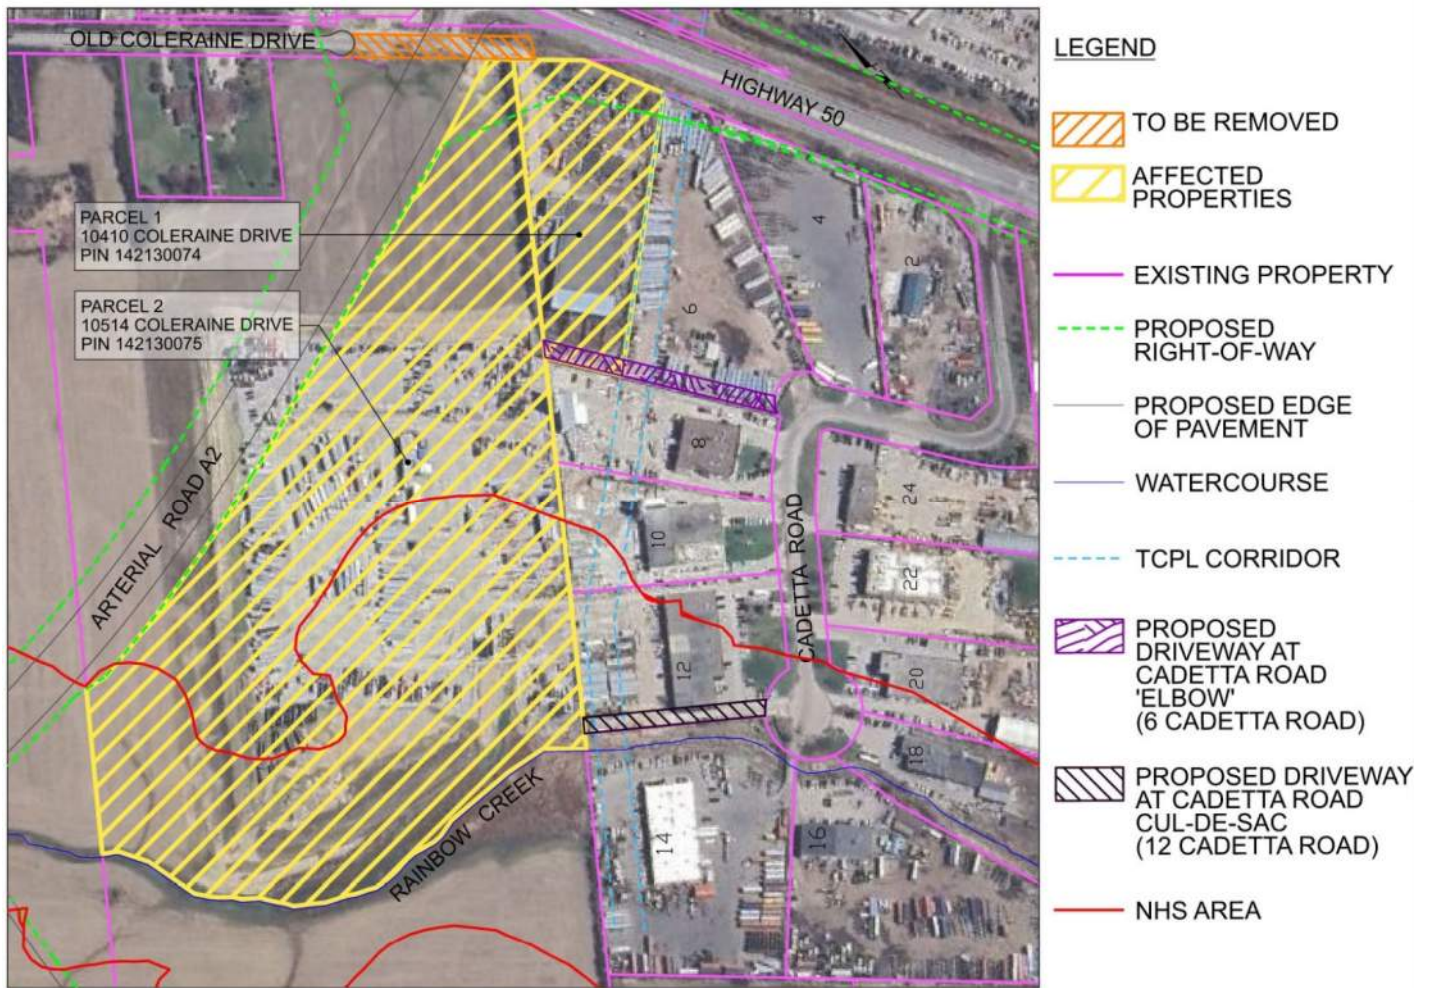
Options 5A & 5B Driveway Connection Options to Cadetta Road
